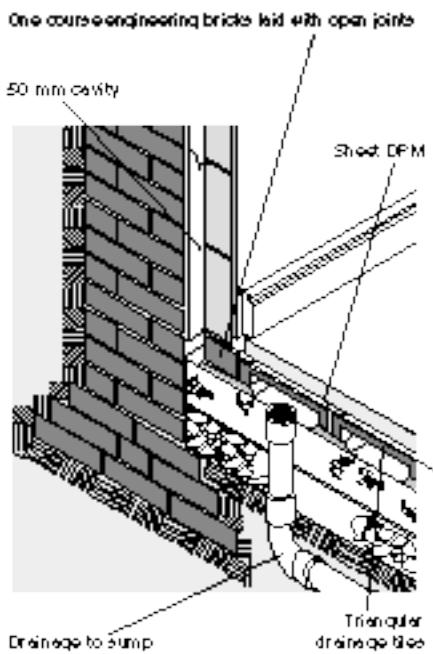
Damp-proofing a basement with joined cavities on walls and floors. This method can be used only where drainage is possible. The drained cavity wall and floor construction provides a high level of safeguard. A ventilated cavity and horizontal DPM prevent moisture ingress
